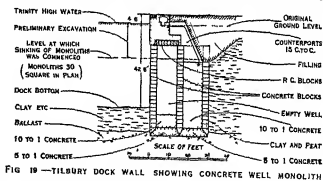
TILBURY DOCK WALL SHOWING CONCRETE WELL MONOLITH
